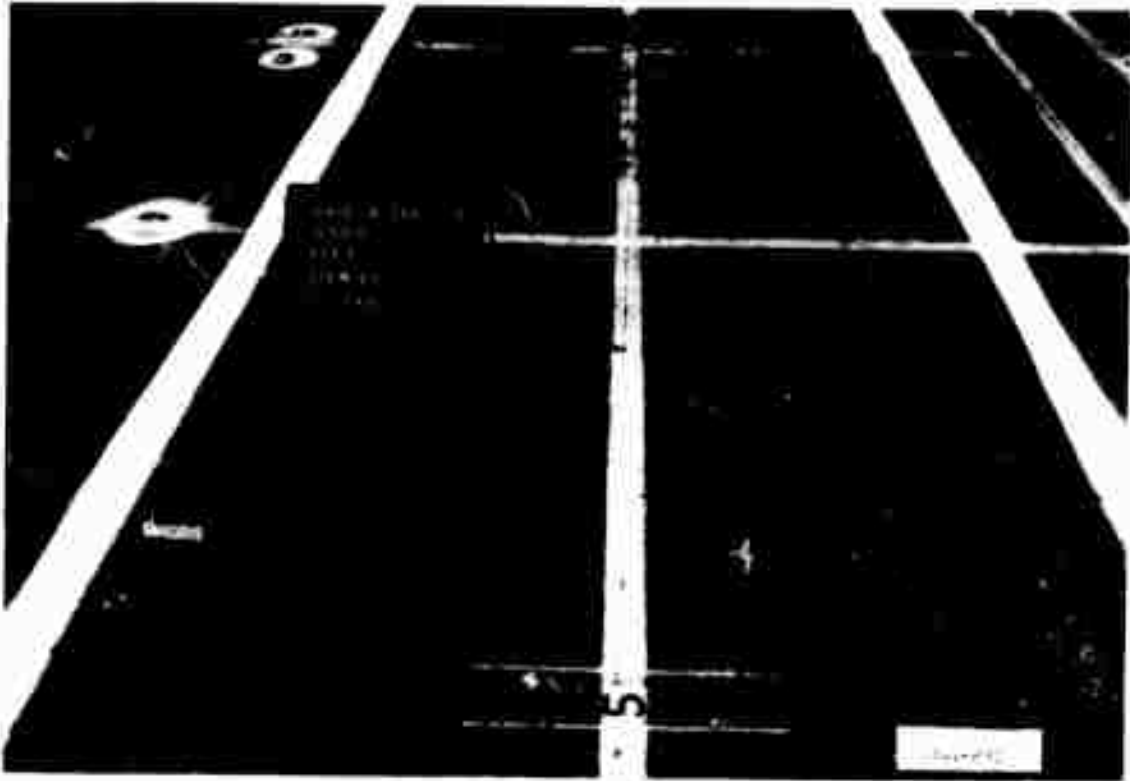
Subitem 4d, lane 3, flexible pavement test section, prior to traffic
